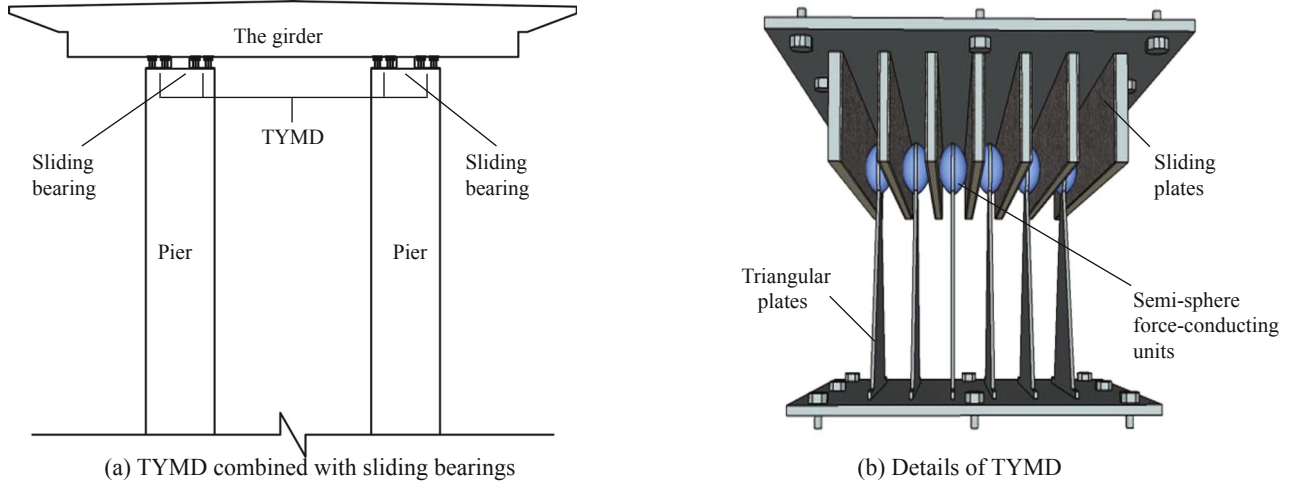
TYMD plus sliding bearings between the girder and top of piers
